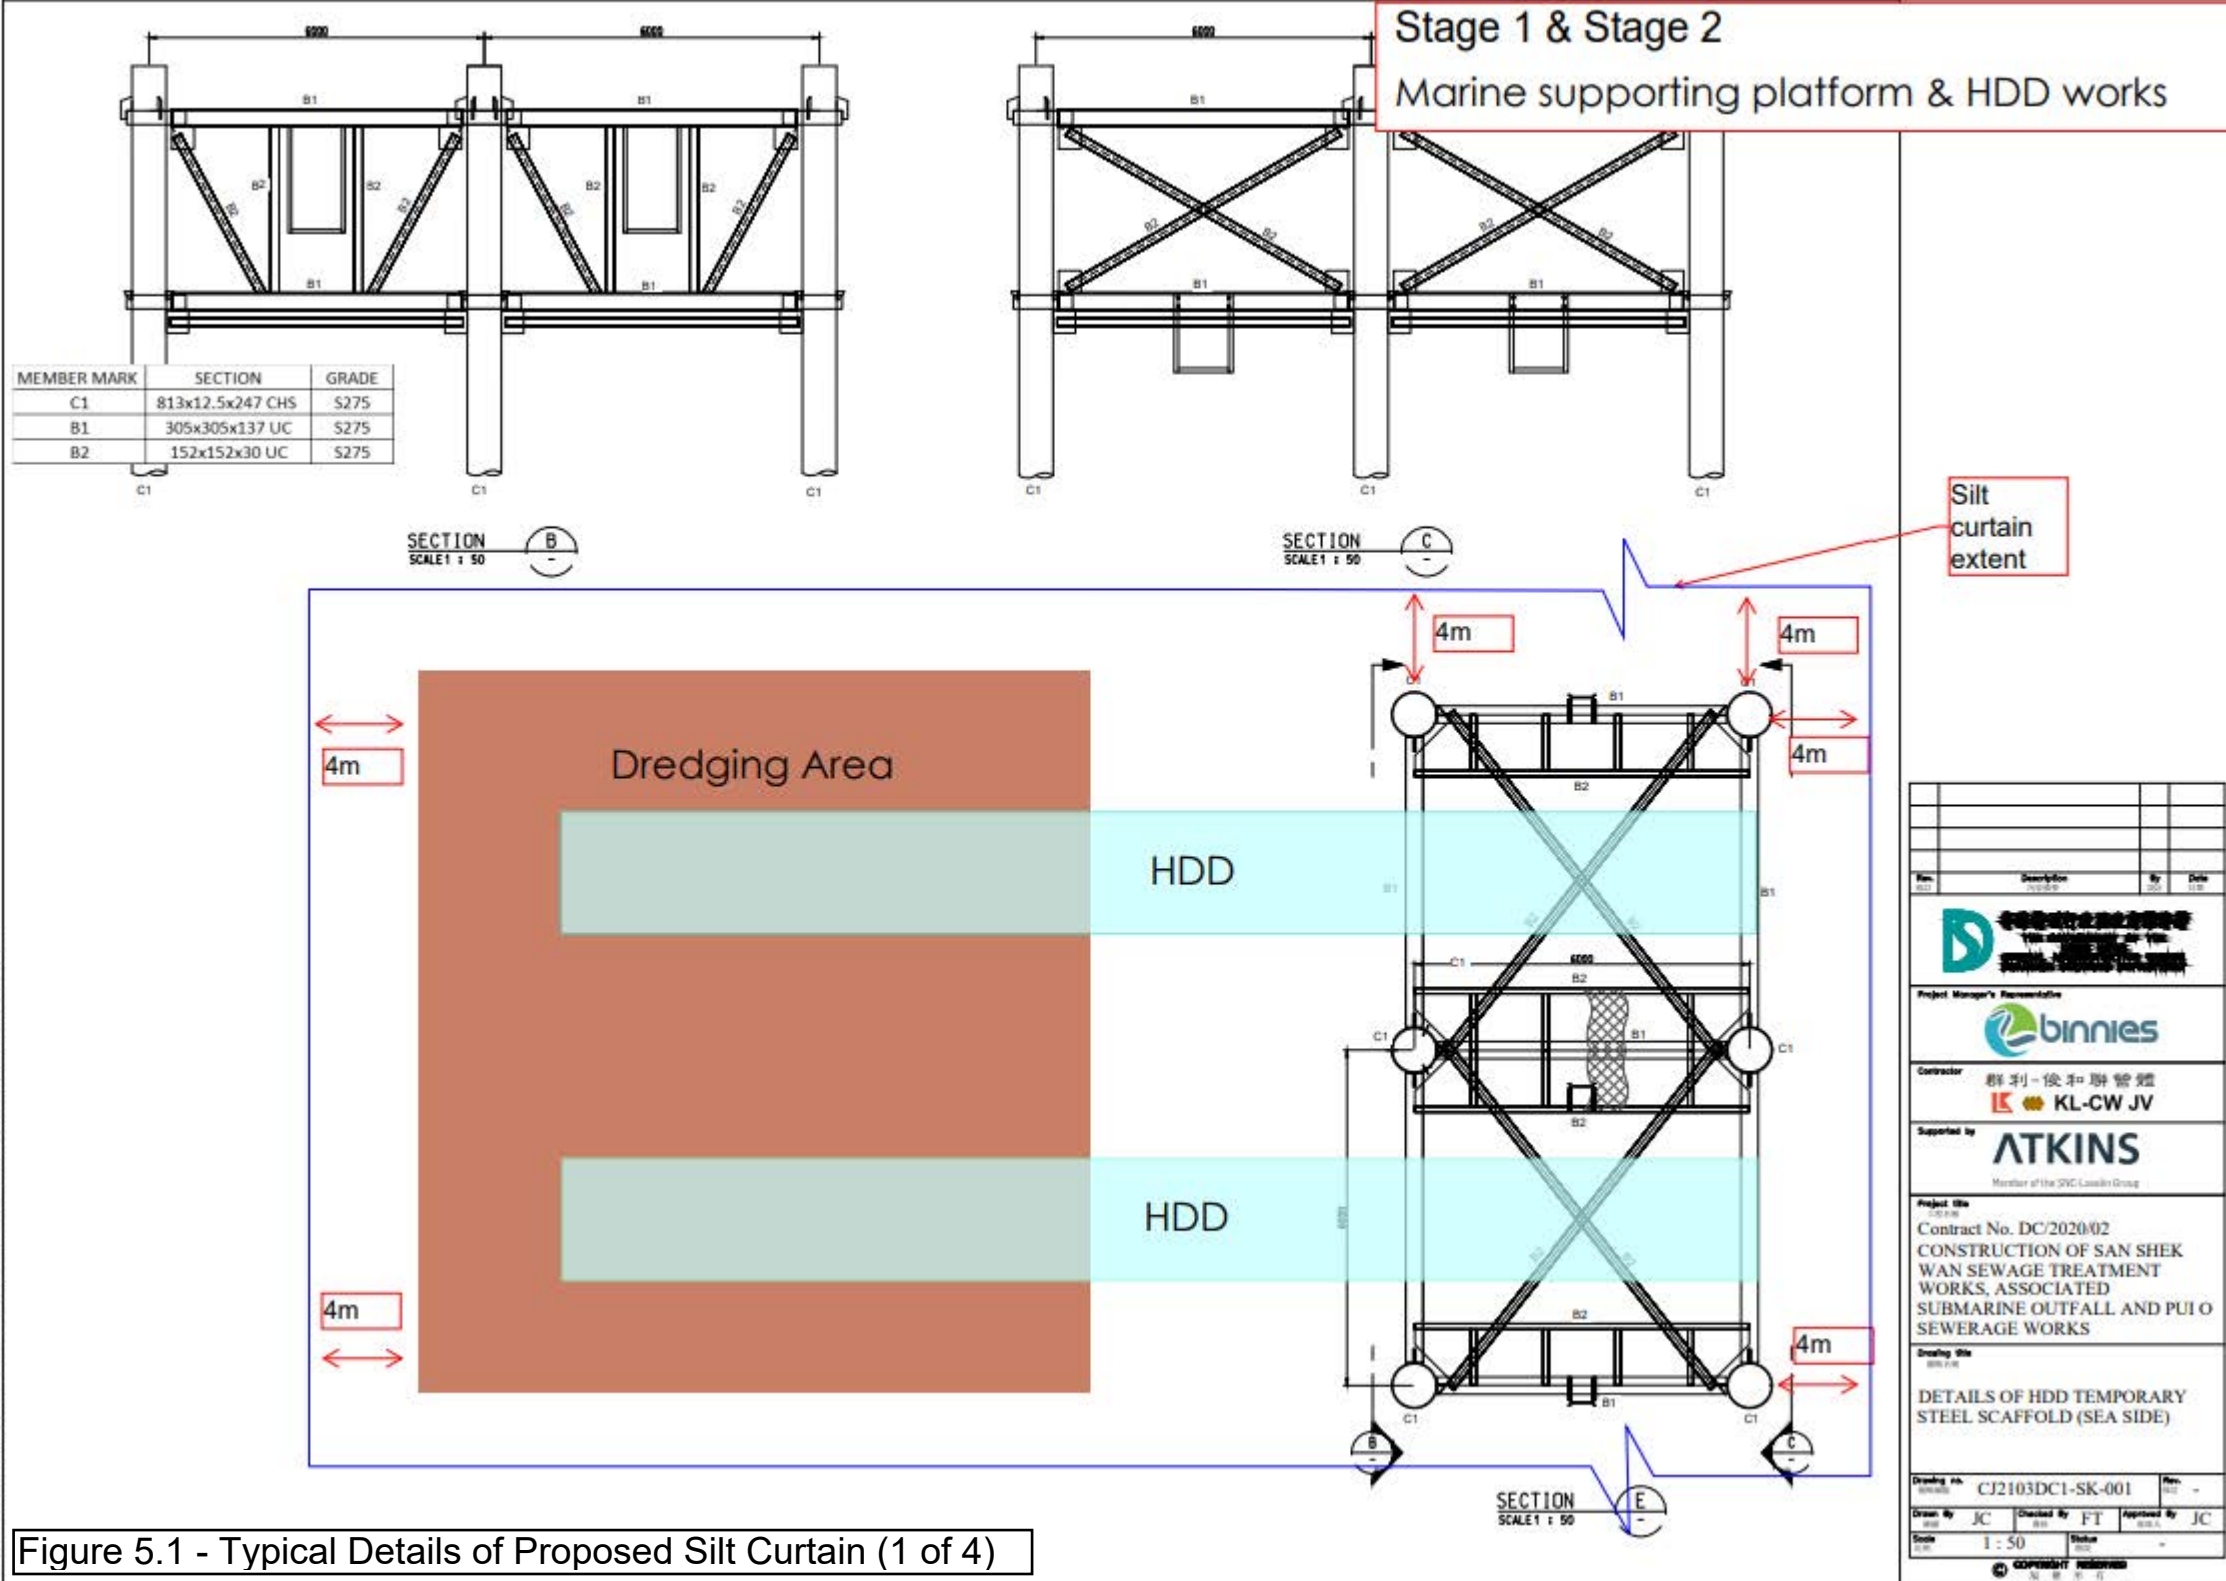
Typical Details of Proposed Silt Curtain (1 of 4)
